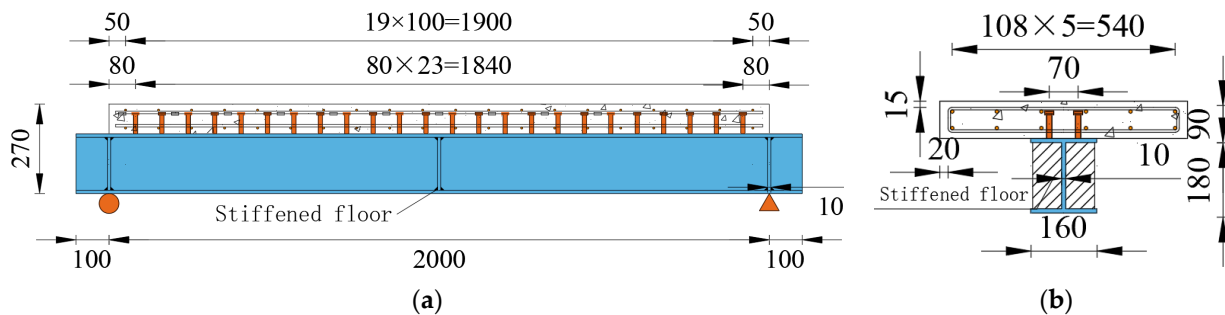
Sectional dimensions of composite beams: (a) longitudinal section and (b) cross-section.
